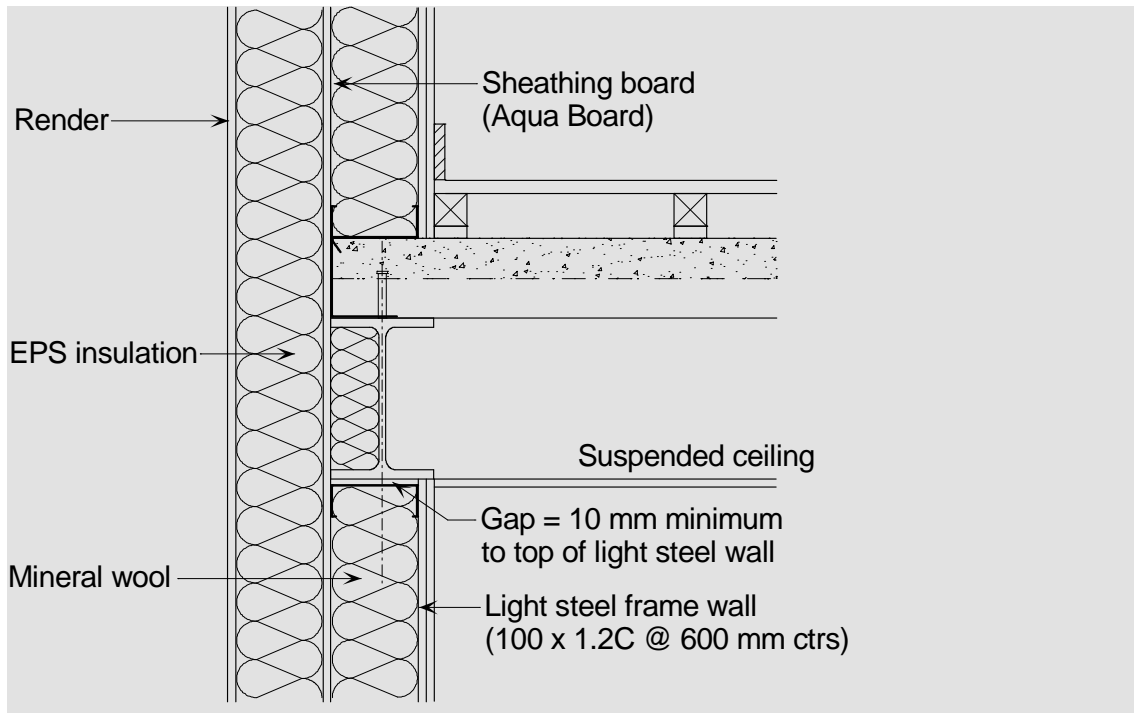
Insulated render (direct fix) applied to an infill wall in a steel framed building
